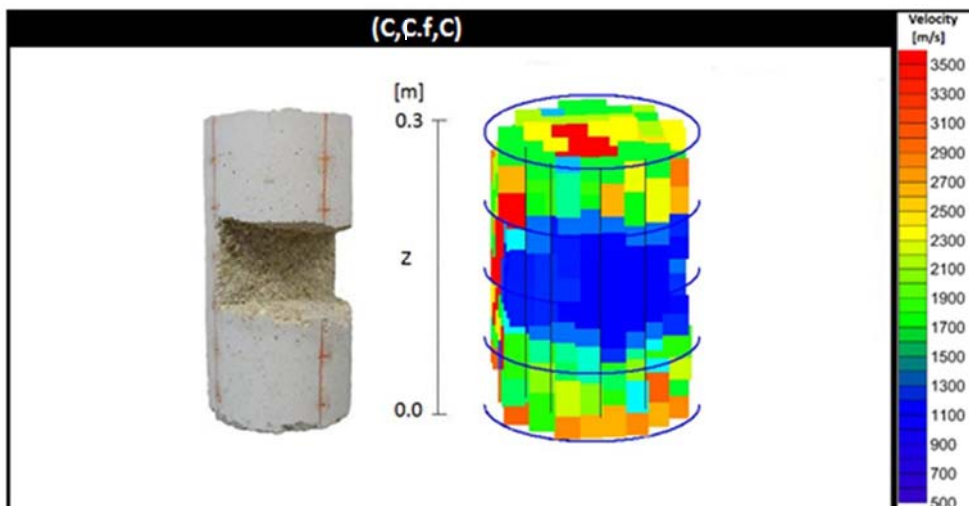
Inspecting of the cylinder (C,C|f,C)(left picture); 3D ultrasonic tomography by Geotom CG (right picture)
